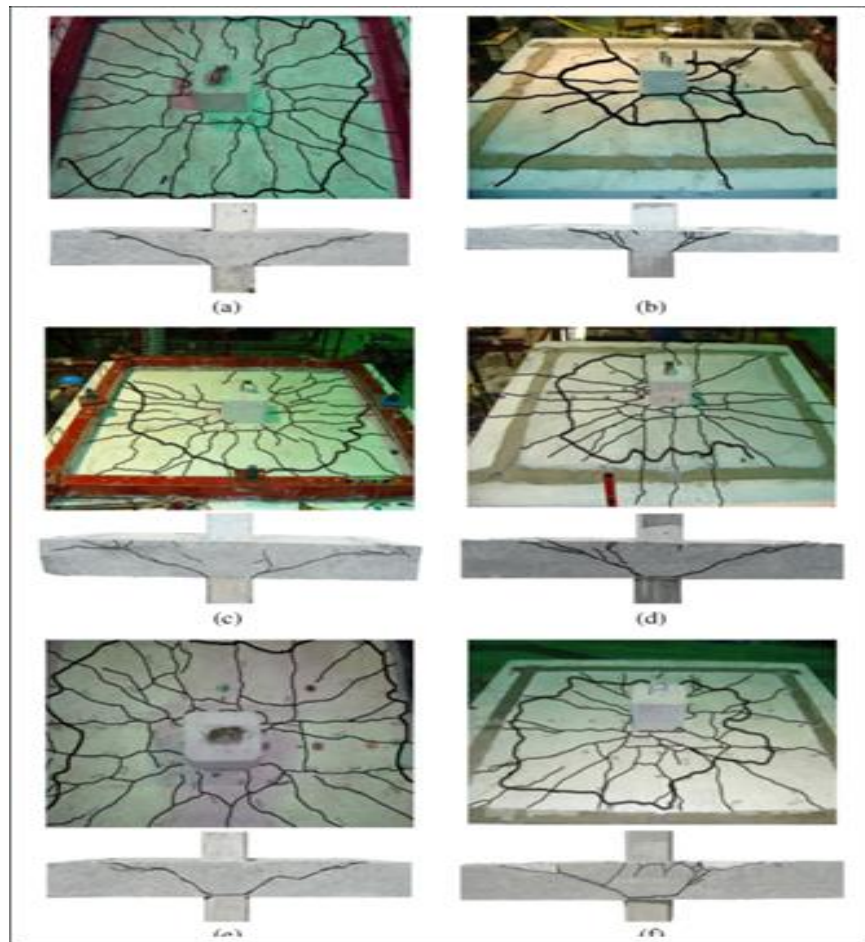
Typical punching-shear failure and main shear crack for some Specimens (Hassan et al. 2013b)
